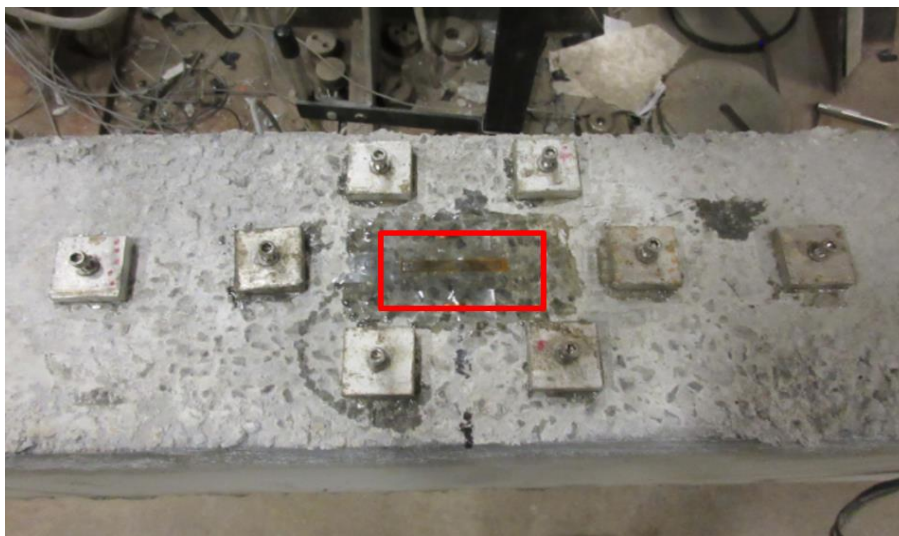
Strain Gauge Installation on the Beam Compression Side.
